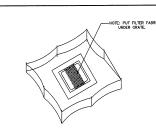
STAKED SILT BARRIER OR SILT FENCE PROTECTION AROUND DITCH BOTTOM INLETS
